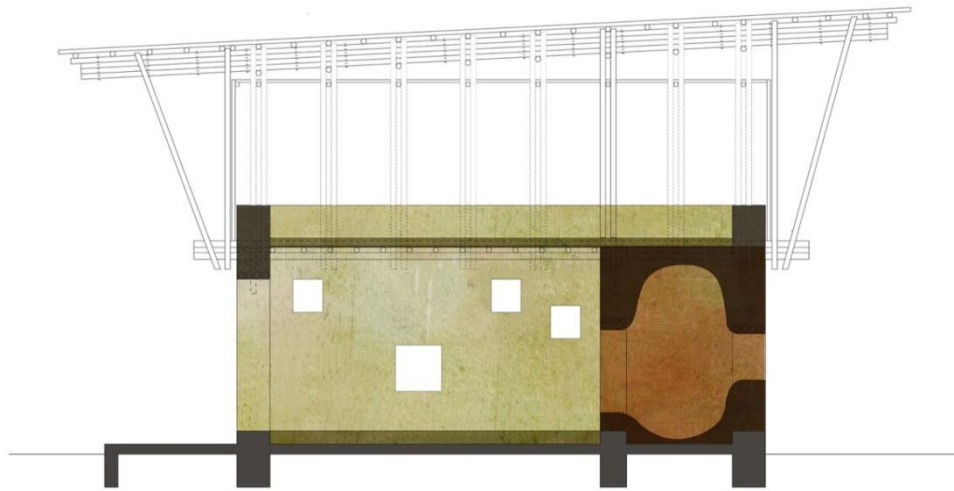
Section showing the construction in brief; Source: www.archdaily.com
